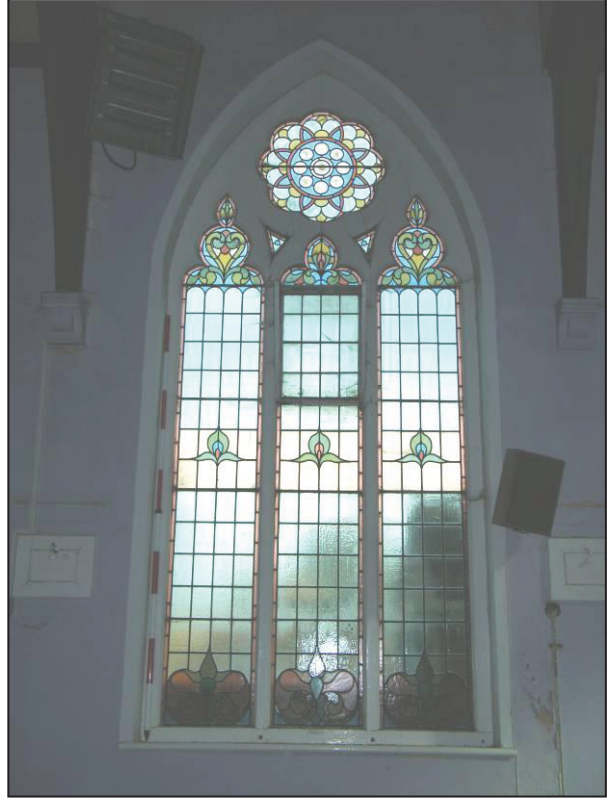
(Shot 44): Internal view of opposing window in gabled bay on north elevation, looking north
